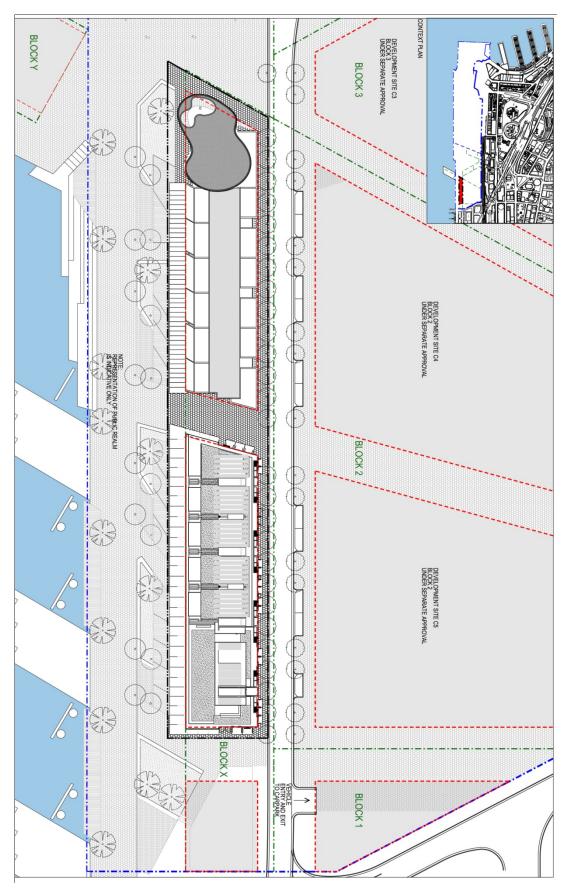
Location of Buildings R8 & R9 within the Concept Plan site
